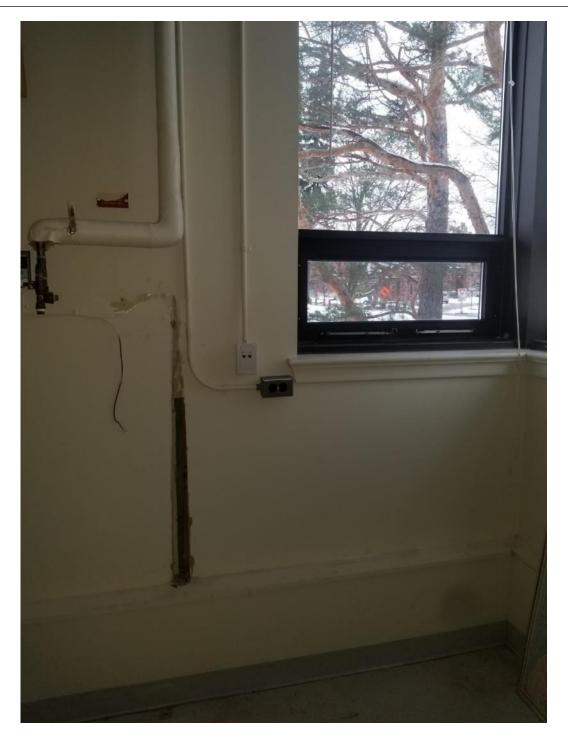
Ground floor, main area, on west wall under window, <1 linear metre fair condition drywall joint compound.
